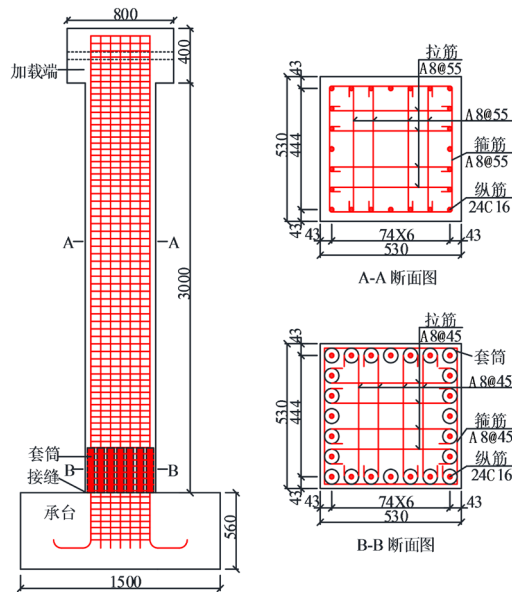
Schematic diagram of the structure of prefabricated bridge piers (unit: mm)
